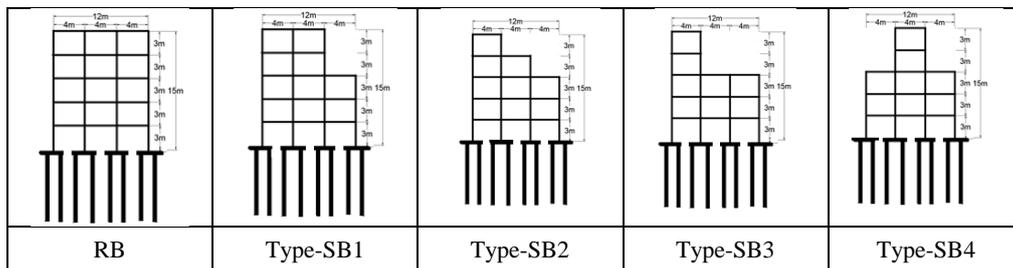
Typical building elevations for five-storey building variants (RB, SB1 to SB4)
